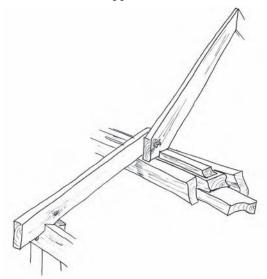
Installation of rafters for the main roof and the verandah, coupling them together at the top boxing
